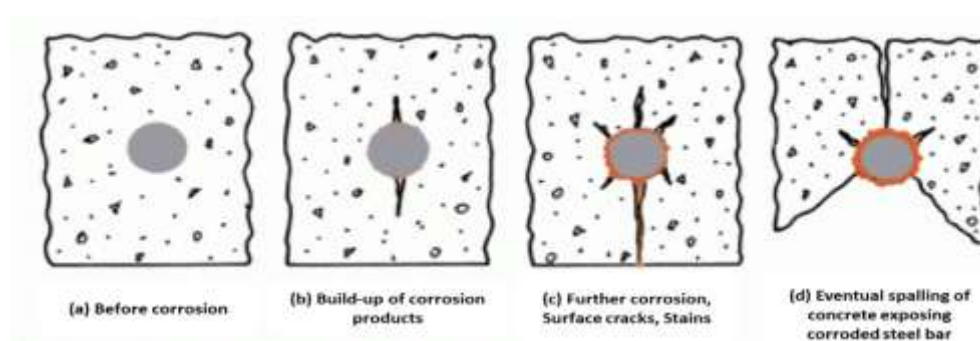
Cracking and spalling of concrete cover due to corrosion of reinforcement [71]
